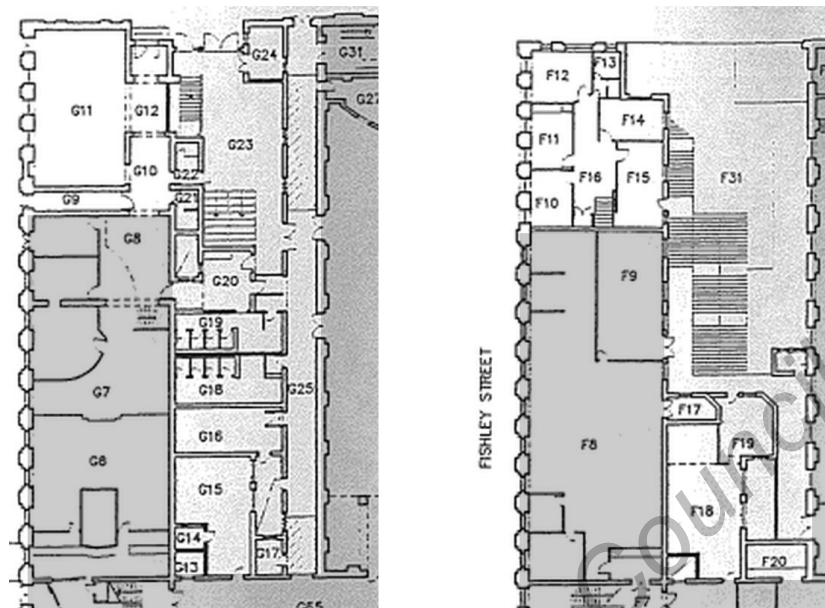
Council Buildings (West Annex) plan arrangement (Ground floor – left; First floor – right).
